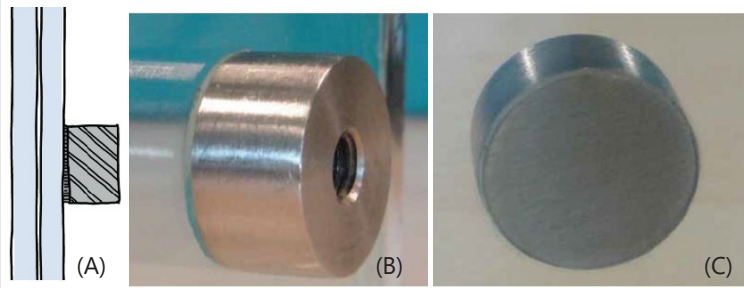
(A) Sketch detail Transparent Structural Silicone Lamine (TSSL) fitting. (B) Close up of Transparent Structural Silicone Lamine bonded point fitting (Sitte). (C) Closeup of Transparent Structural Silicone Lamine bonded point fitting through glass (Sitte). Source: Rammig, L. (2021). *Advancing transparency*, IOS, Delft.
